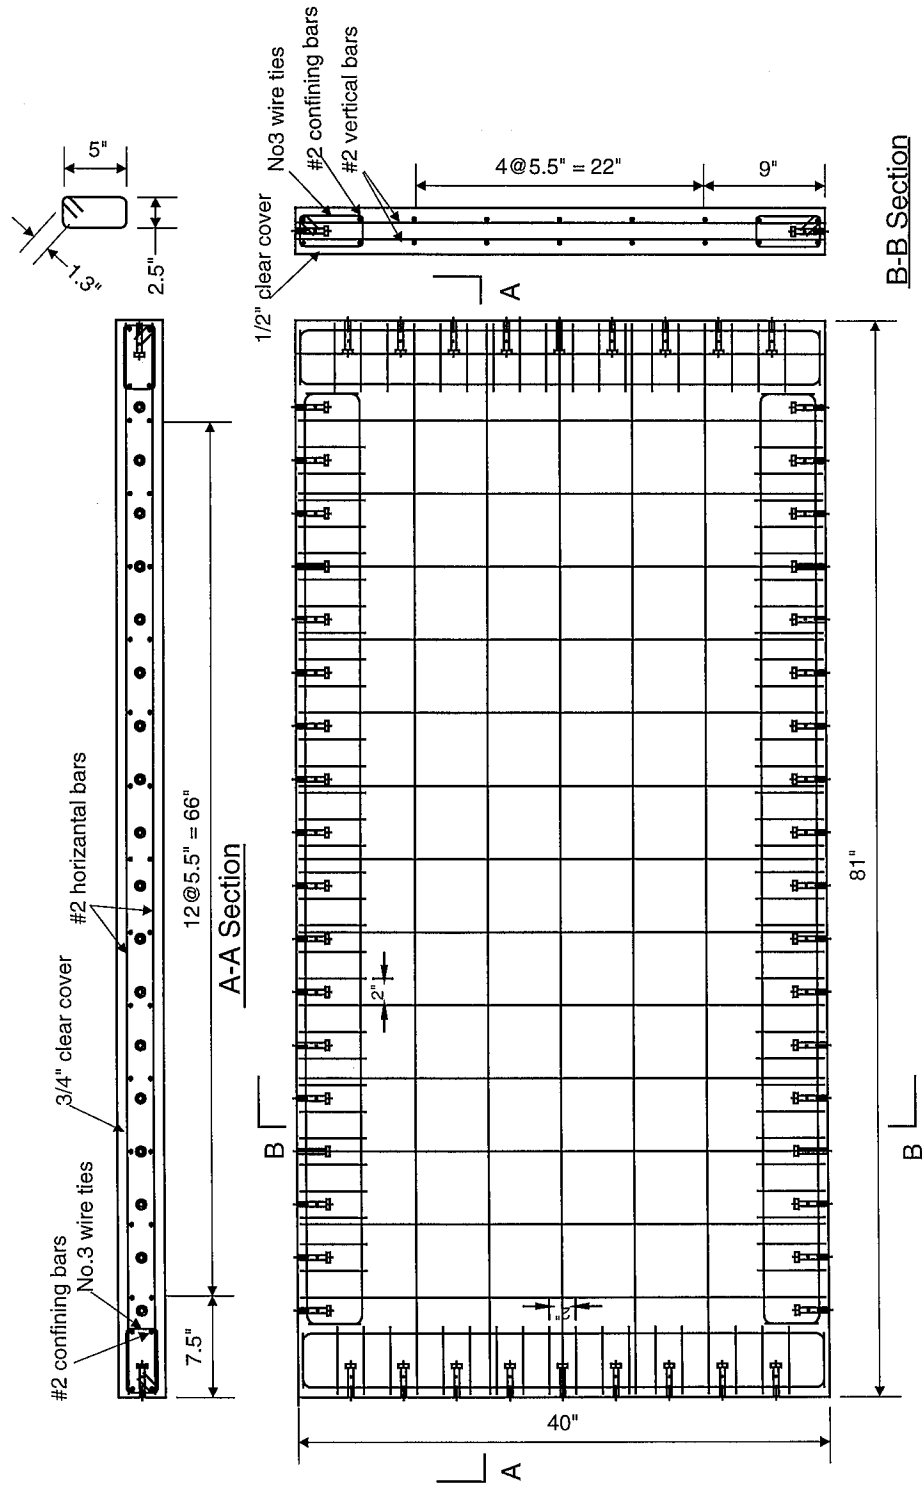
Detailing of Confining Cages and Wall Reinforcement
